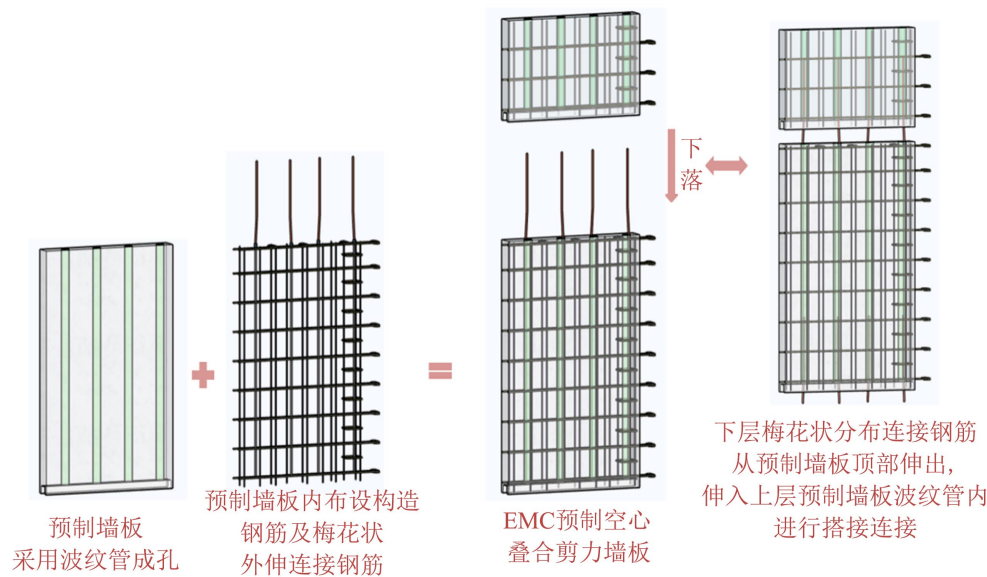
Efficient reinforcement and construction of EMC hollow composite shear wall
